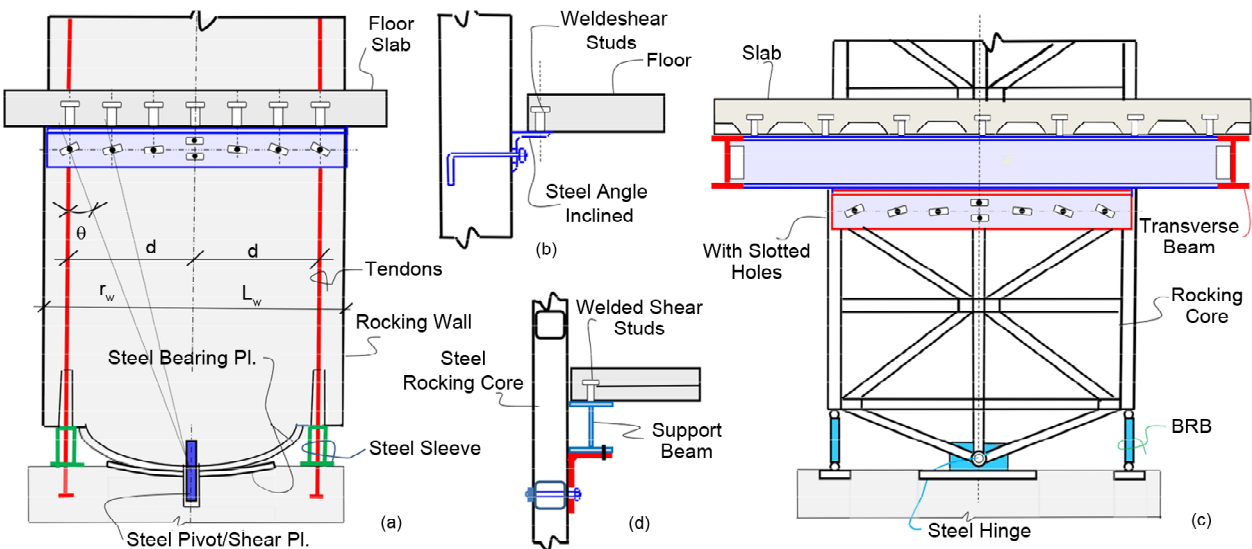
(a) Generic concrete RRC, diaphragm and base level connections (b) Side view of (a), (c) Generic BRB enhanced Steel RRC, diaphragm, and base level connections, and (d) Side view of (c).
